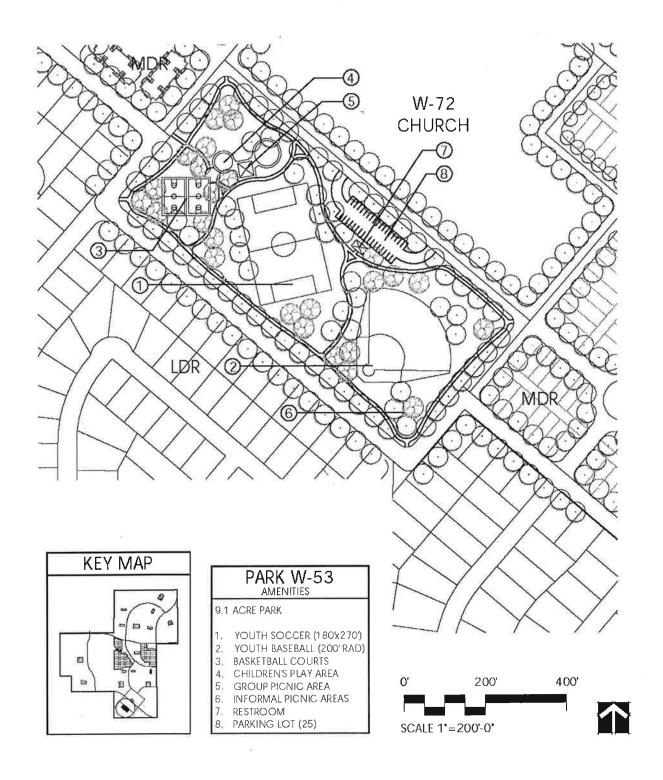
Original Village Center Neighborhood Park Conceptual Plan
